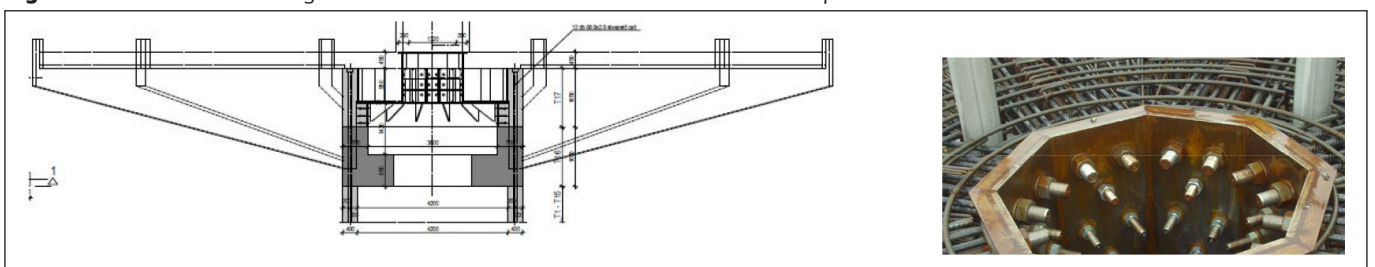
Cantilevers and anchoring to the final mast element and reinforcement of bottom plate
